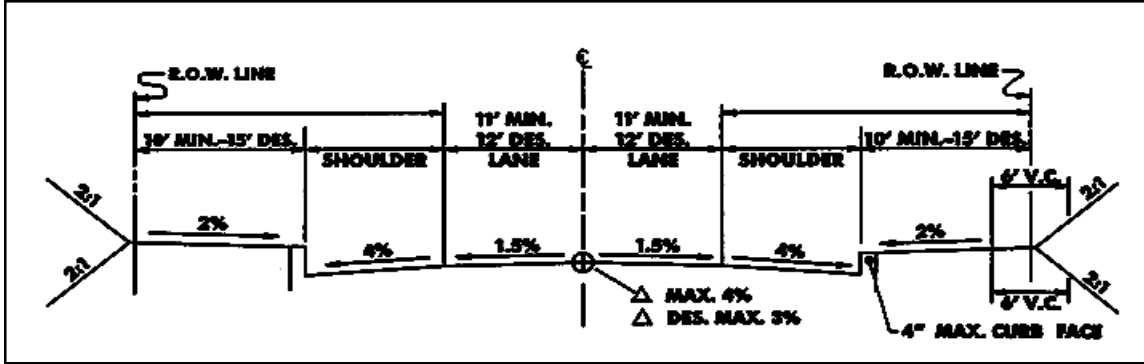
Typical section for a two-lane highway from New Jersey's Roadway Design Manual.
